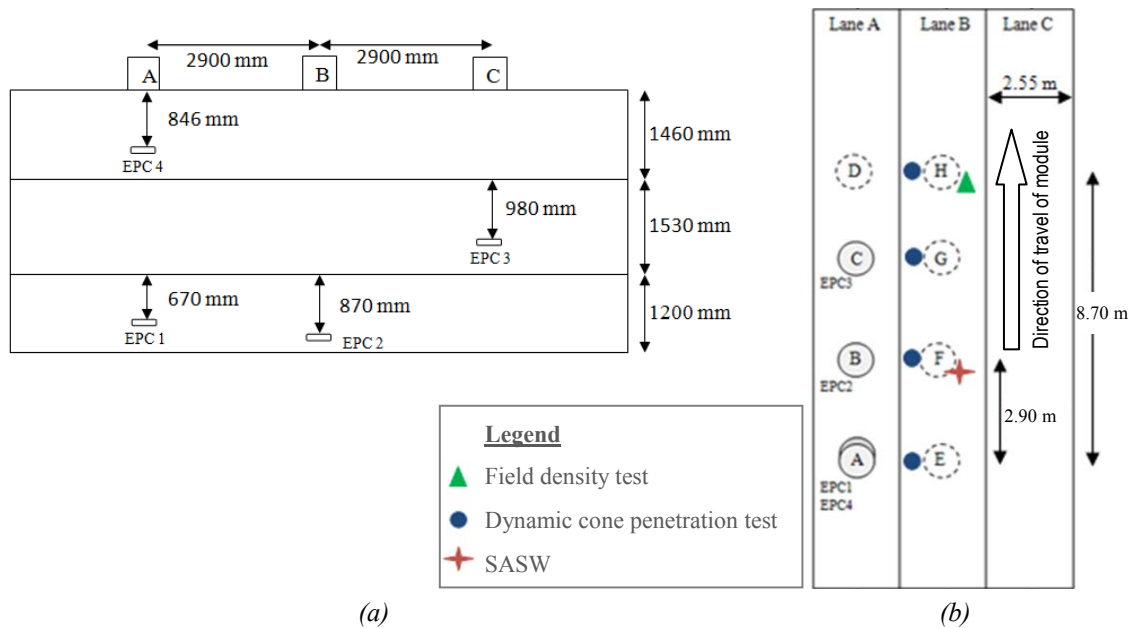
Details of test pad: (a) cross-sectional view, (b) plan view.
